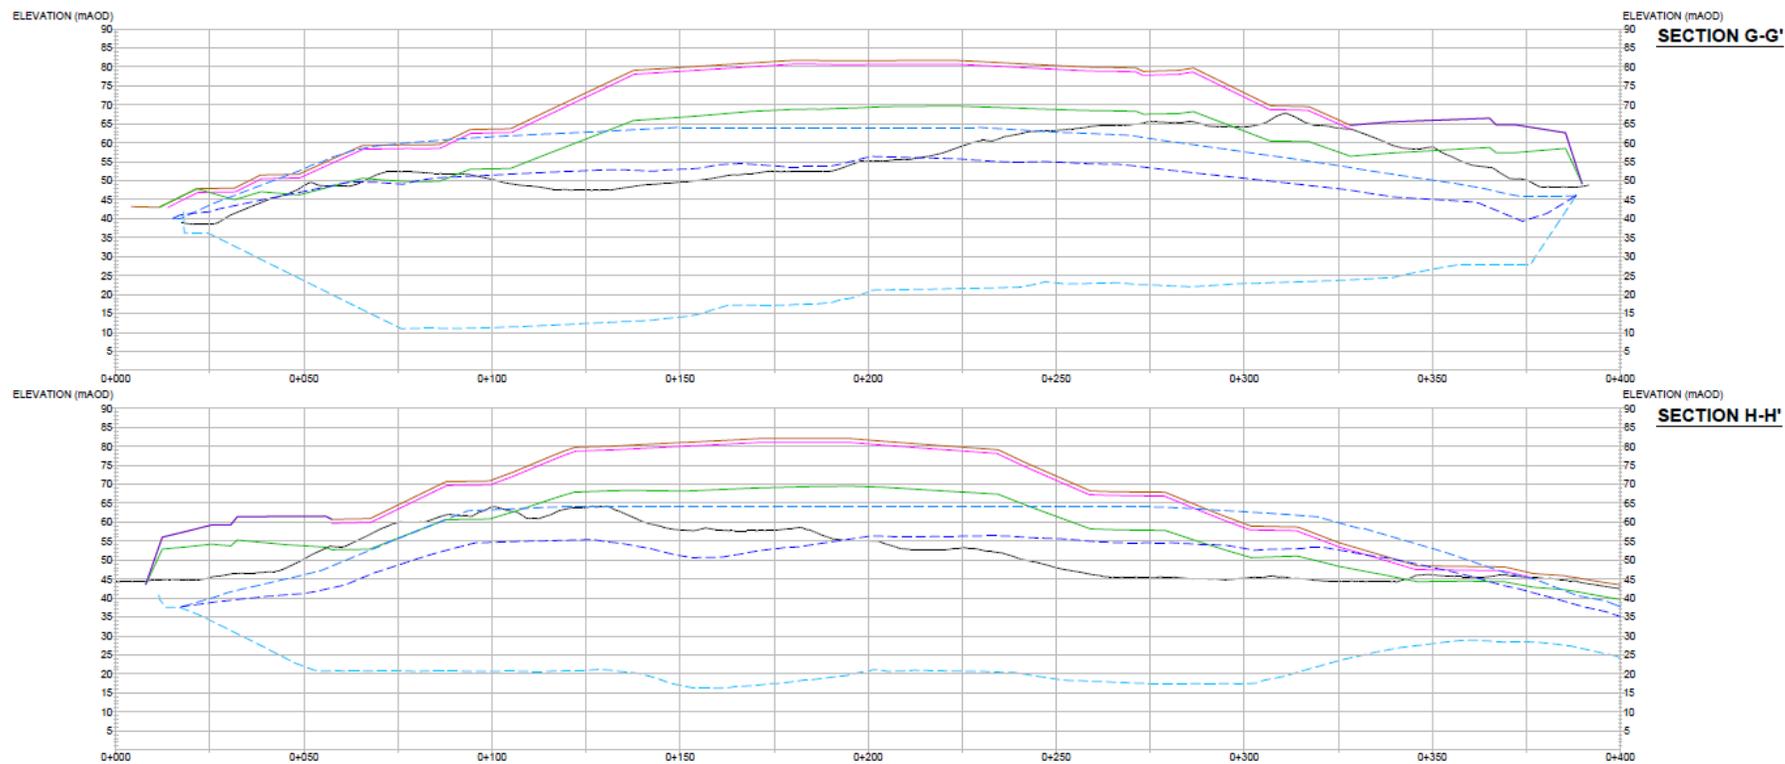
Sections of the proposed landfill (Source: PDS appendix)
